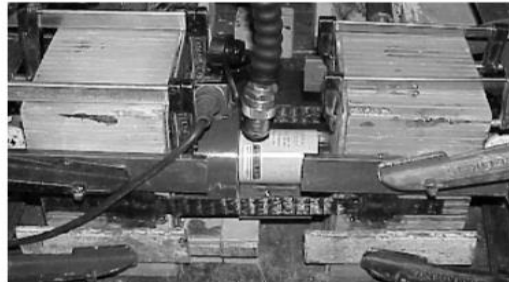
CFRP anchor bonding to hollow clay tile specimen (Camlı, 2005)
